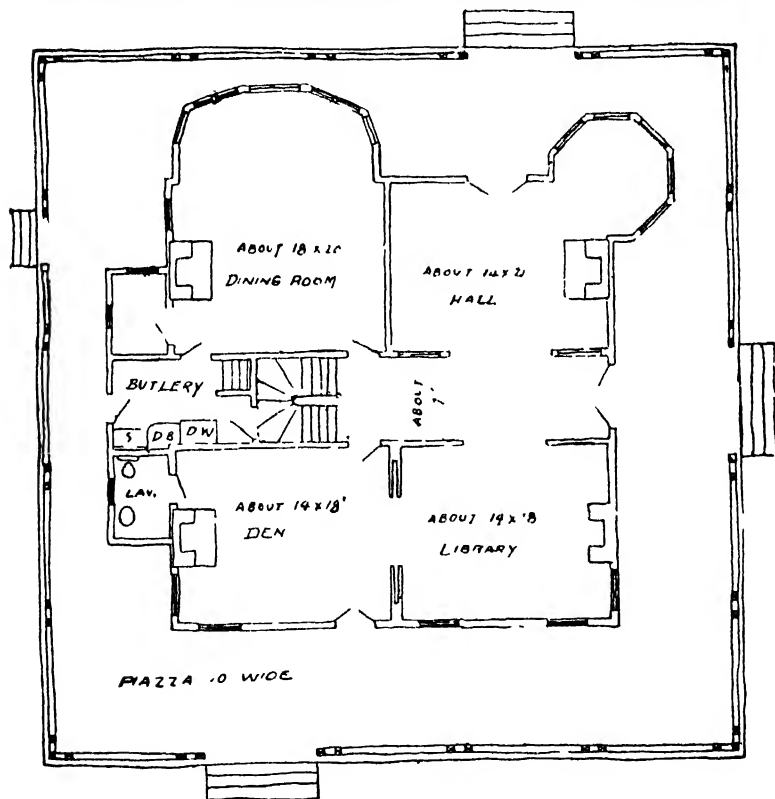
,337.—Architect's preliminary free hand sketch conforming to owner's ideas indicated in fig. 1,648. First floor plan.
